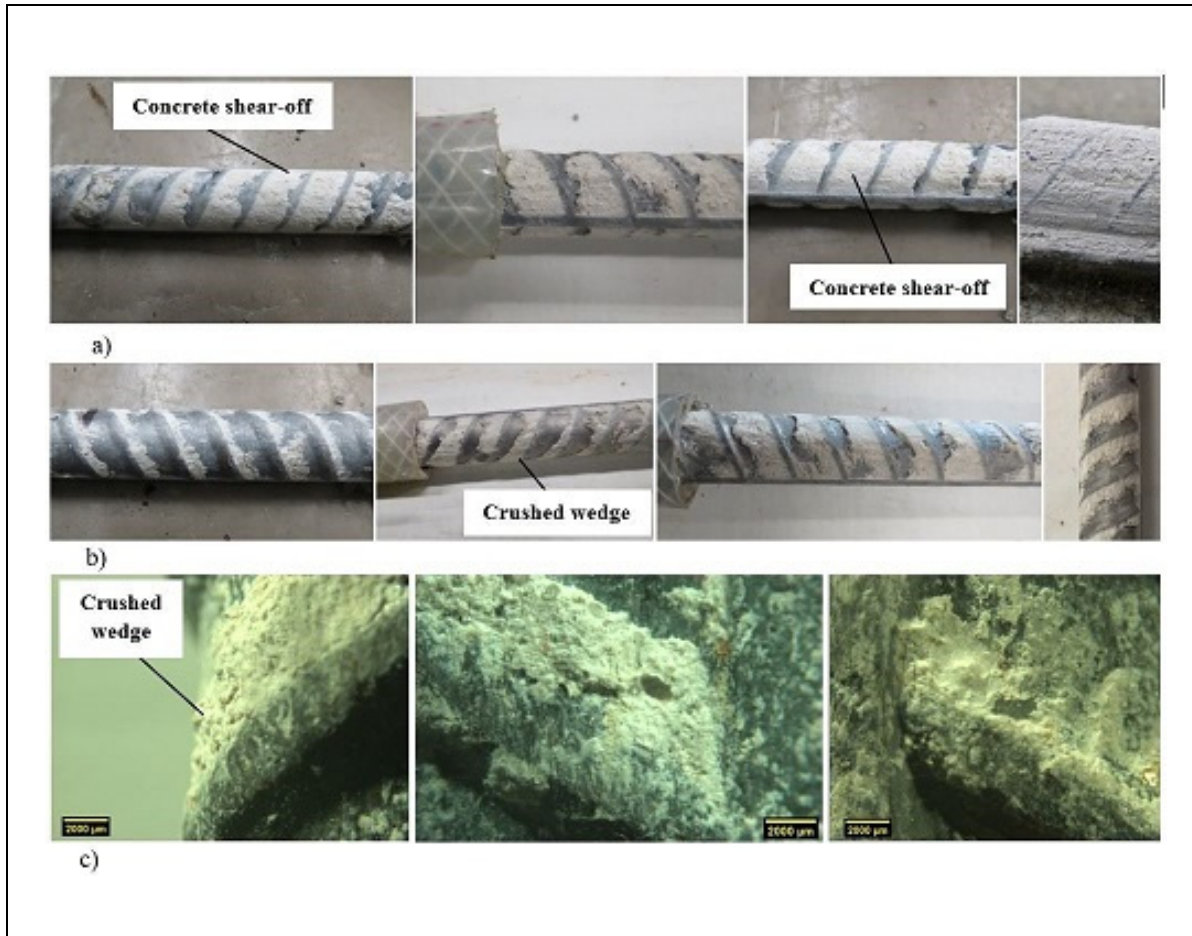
Failure mechanism: (a) sheared-off concrete in uncracked specimens; (b, c) crushed wedge-shaped concrete blocks in pre-cracked specimens
